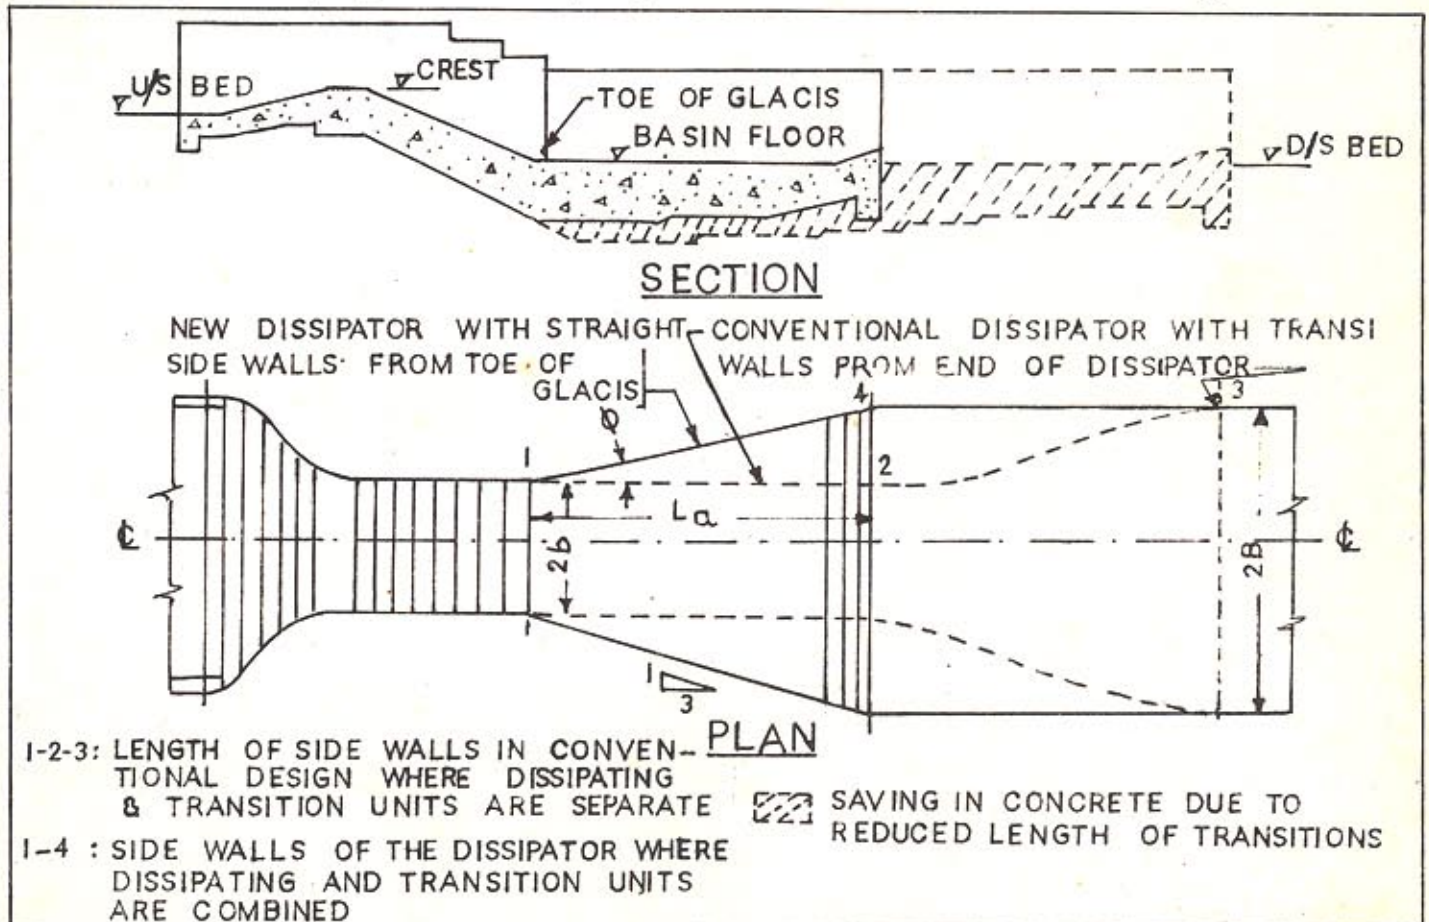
Conventional type and new dissipator indicating savings in concrete in floor and masonry in transition walls
